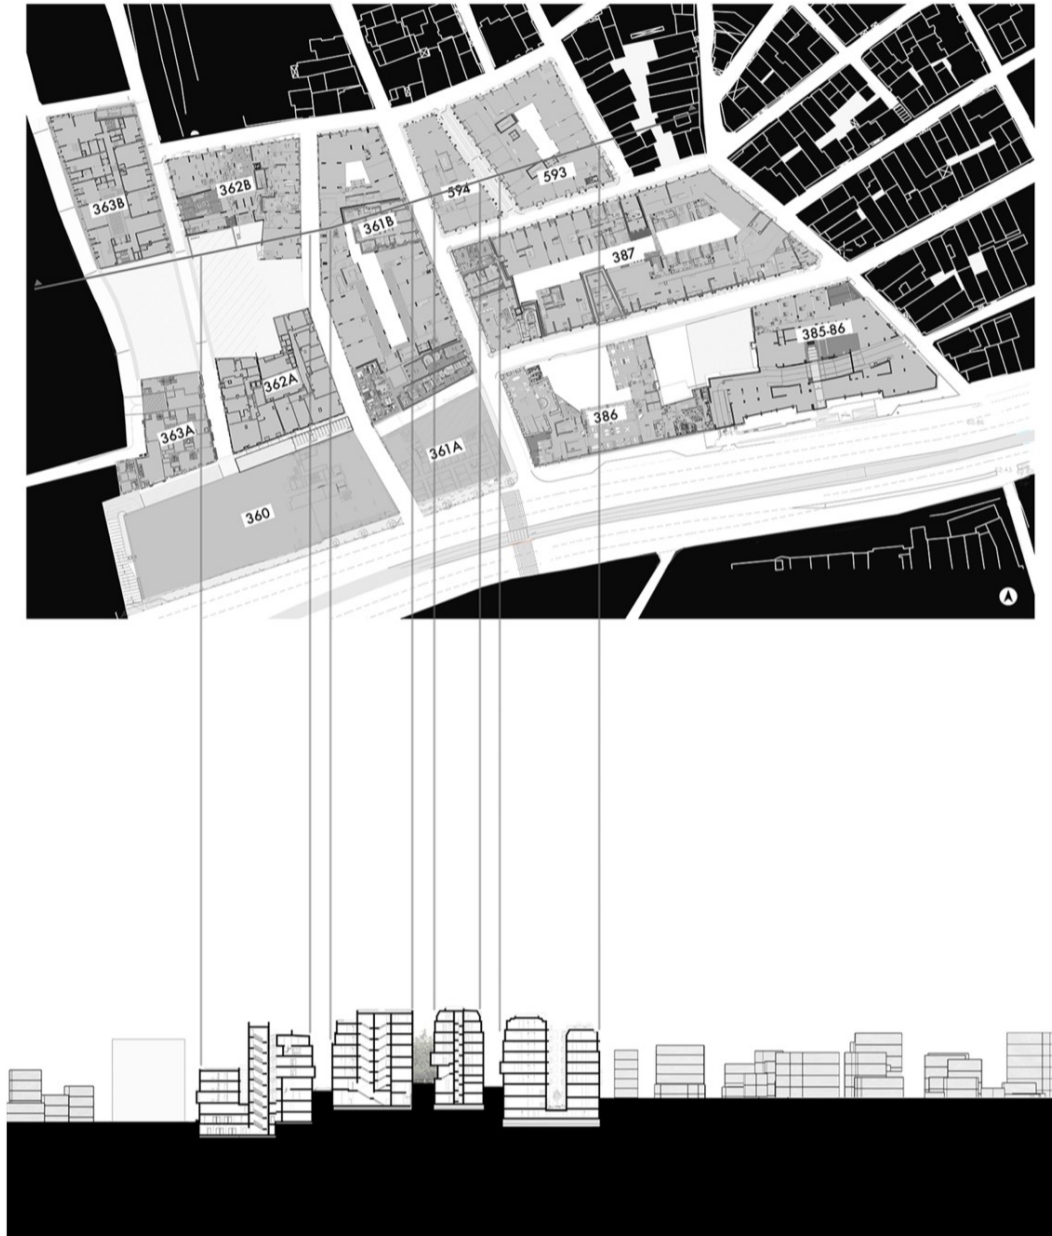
Beyoglu-Tarlabasi Floor Plan, Section 1 (Taksim 360 Archives, Author)
